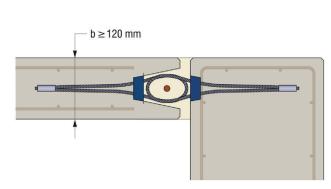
Wall - Wall - CORNER CONNECTION - standard detail
